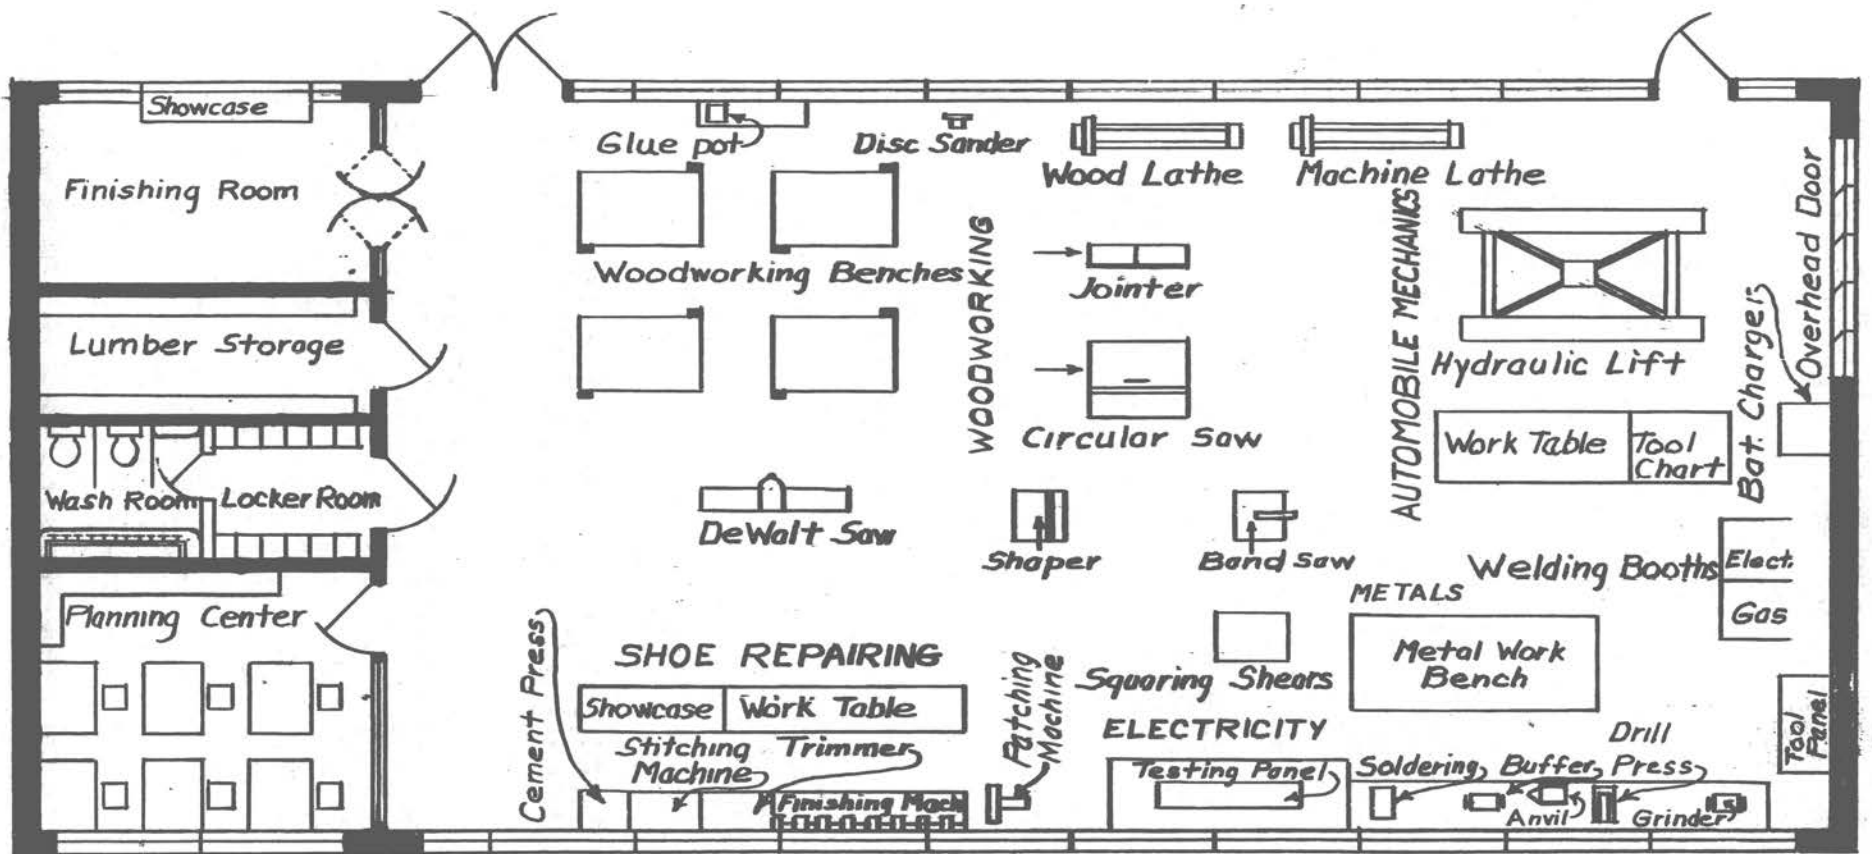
Floor Plan Drawing of the Proposed Industrial Arts Shop at Washington School, Stillwater Oklahoma
